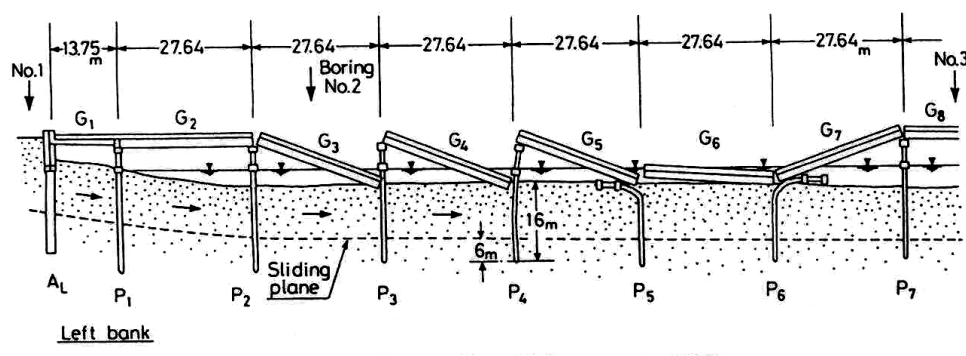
Schematic diagram of the Fall-off of the girders in Showa bridge (Takata et al., 1965)
